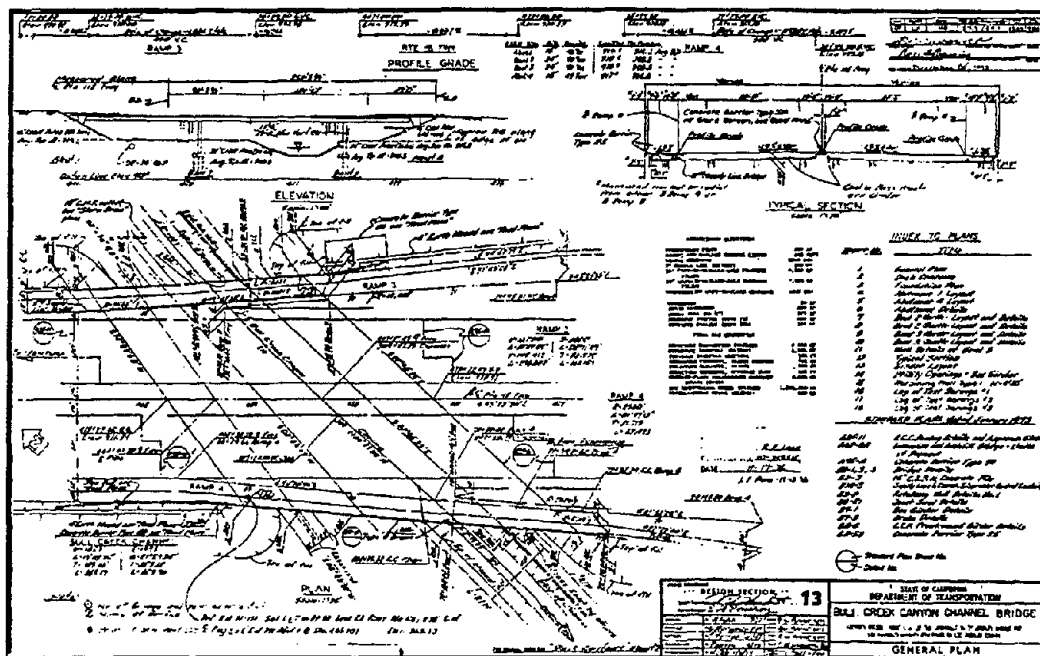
General Plan for Bull Creek Canyon Channel Bridge.
